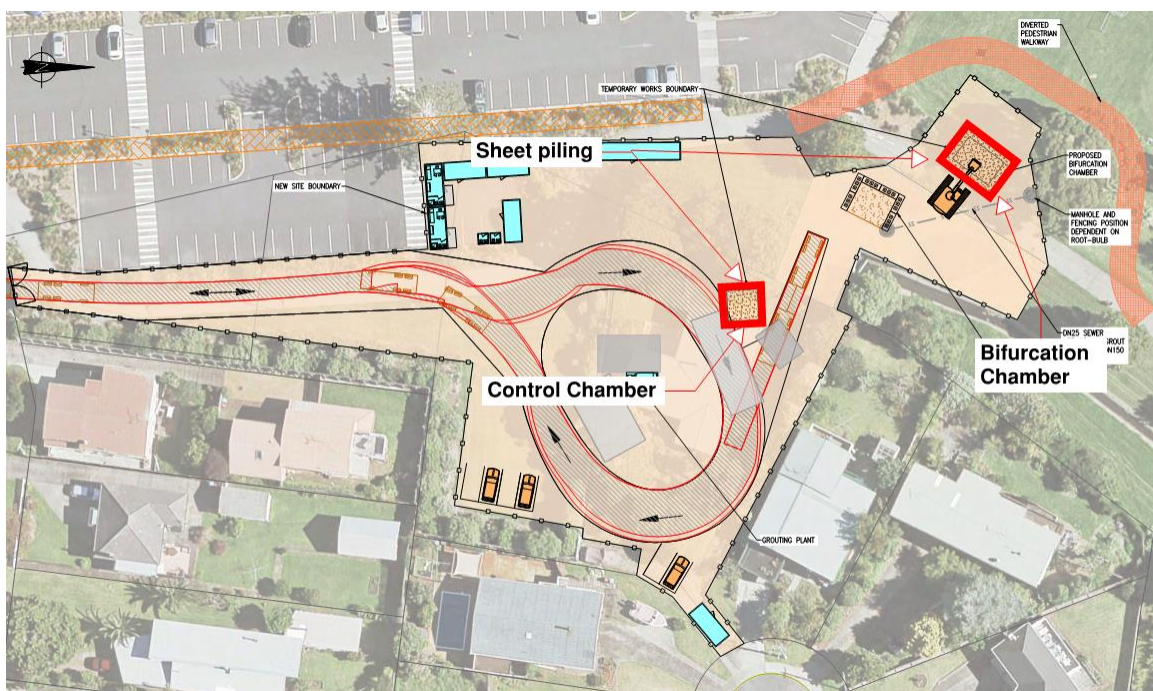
Sheet Piling Location – Branch 9B South Site (sheet piling location shown in red)
